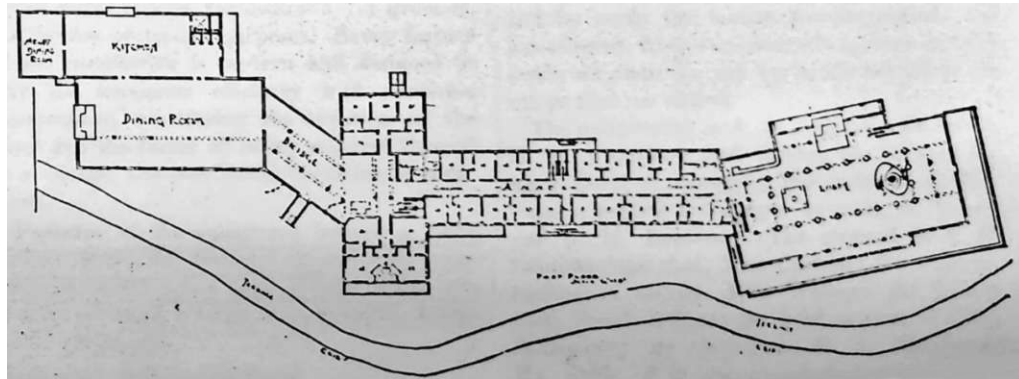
Floor plan of the Many Glacier Hotel as of 1915
